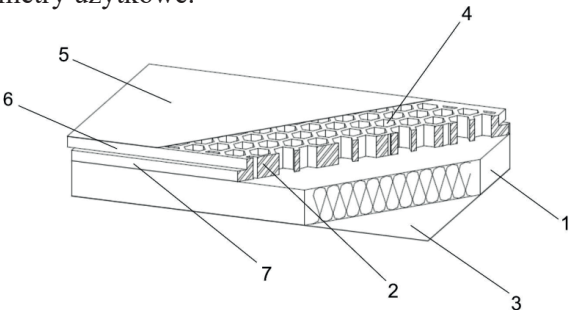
Schematic structure of the sandwich panel: 1) outer layer, 2) polyurethane core layer, 3) outer veil, 4) openings in the insulation layer, 5) inner veil, 6) outer frame, 7) technical panel joint
